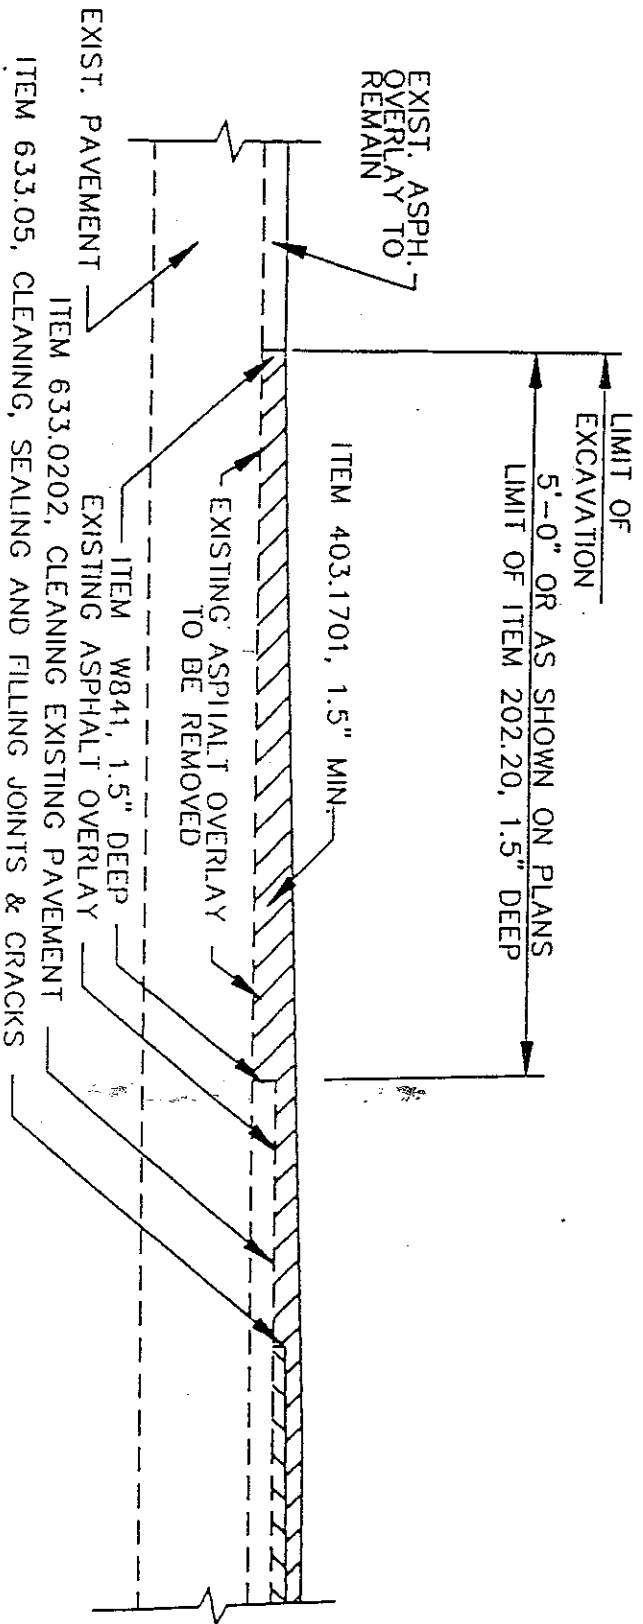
DETAIL OF PERMANENT CONCRETE PAVEMENT REPLACEMENT WITH ASPHALT OVERLAY
